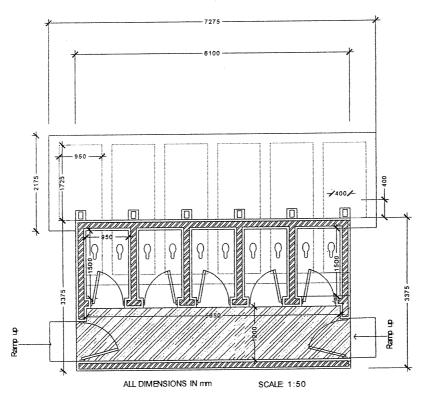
Floor Plan of the 5-compartment VIP Latrine
